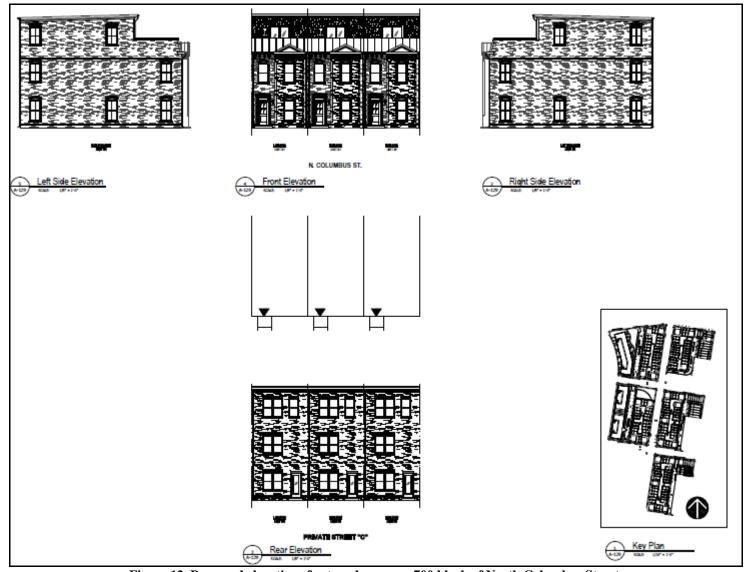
Proposed elevations for townhouses on 700 block of North Columbus Street.
